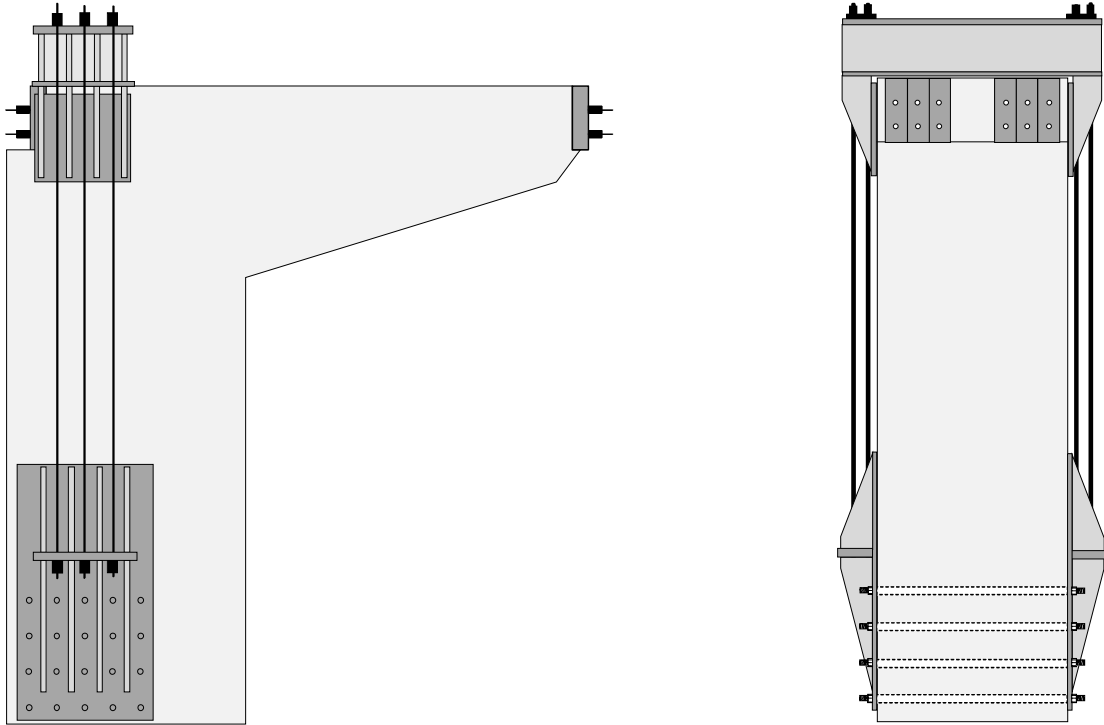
Scaled, Modified Design for Specimen [From Ref. 3]
